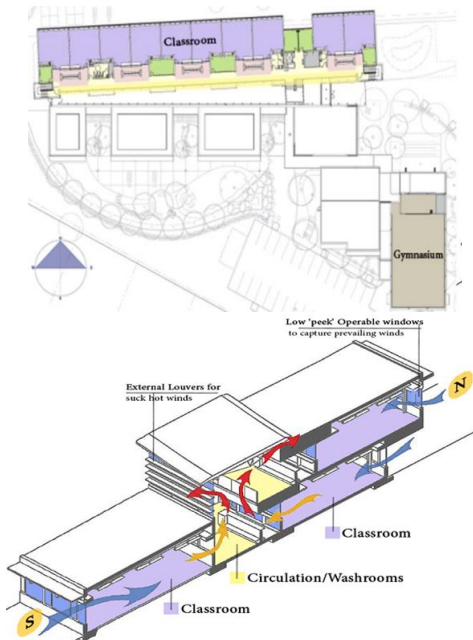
school section and plan show the ventilation mechanism. (Perkins+Will, 2012)
